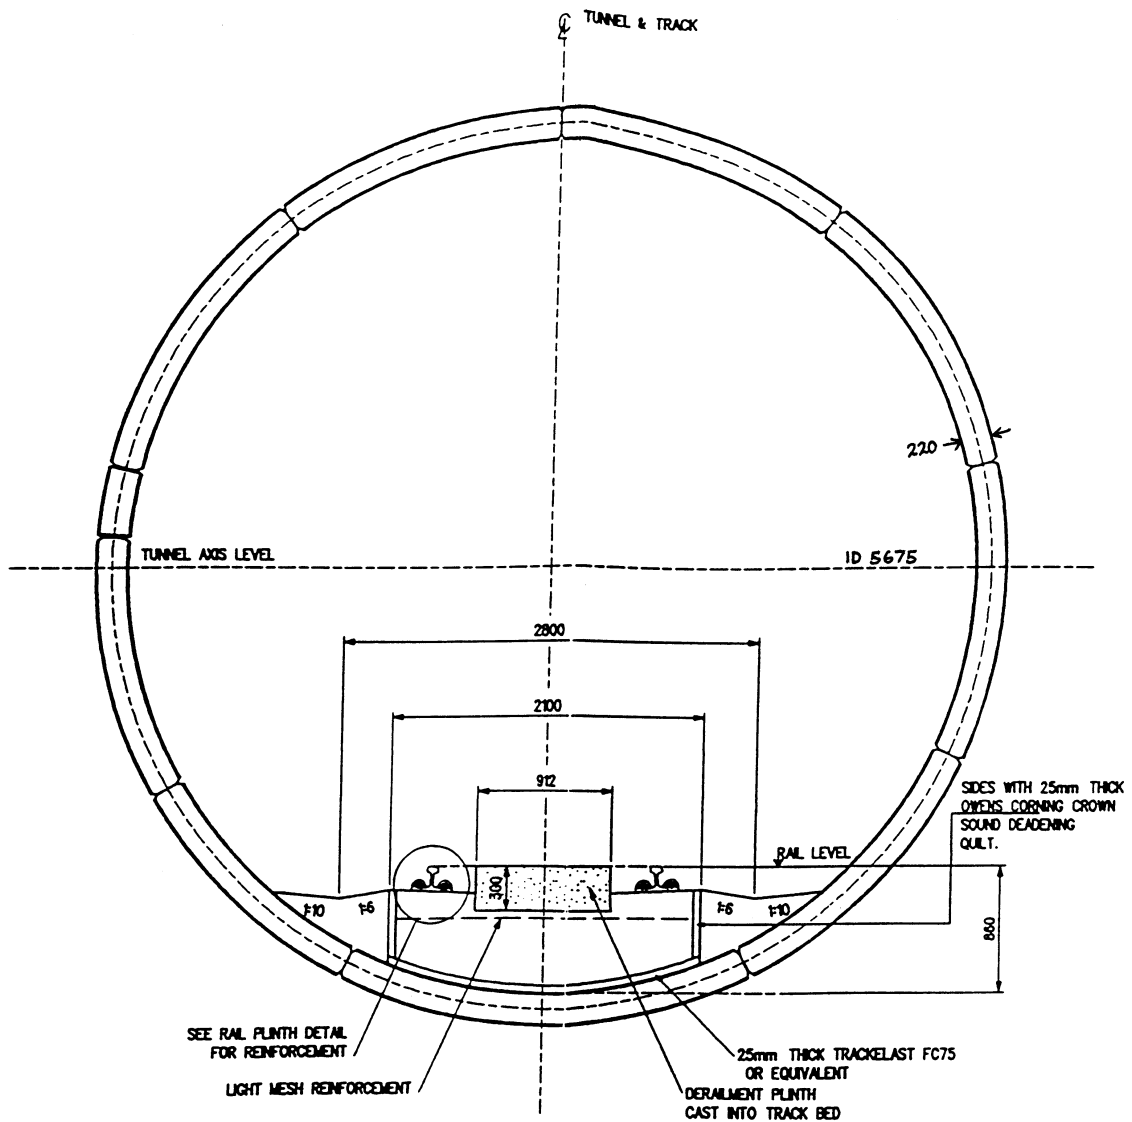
Cross-section showing the construction of the floating-slab track at the measurement site. The unisolated track is the same but without the FC75 and quilt layers. A section of tunnel lining consists of nine pieces held in place by a smaller key piece, shown above the horizontal centreline at left. All dimensions mm.
